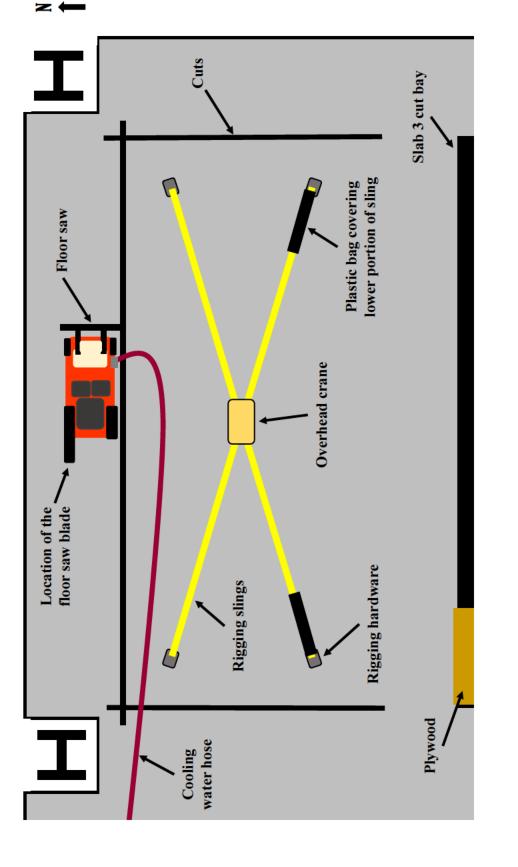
Planar view diagram of the northeast corner of the CF Project test frame showing the sectioning of Slab 4. (a) North, east, and west faces of Slab 4 were cut prior to lunch and the saw left on the north side of the slab.
